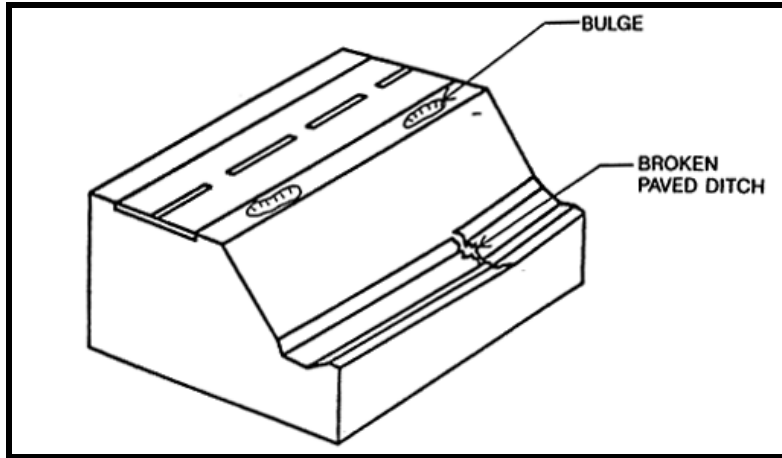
Bulge of pavement and broken paved ditch (FHWA, 1988)
